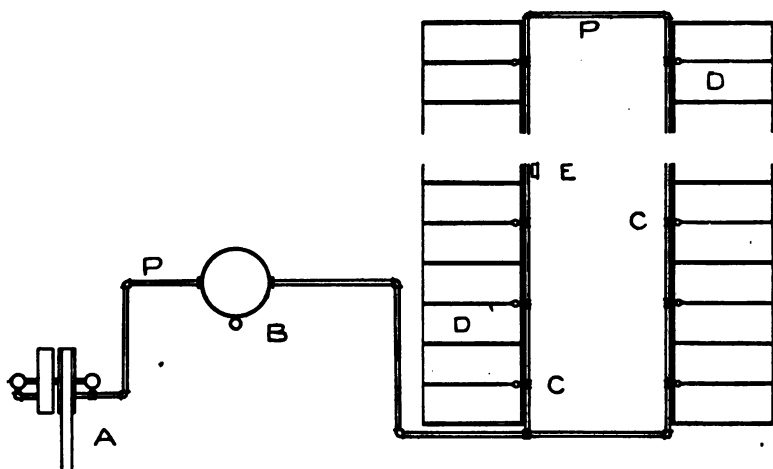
Plan of installation of the milking machine in the University dairy barn. The milking is done by partial exhaustion of the air from tightly covered pails. A partial vacuum is produced by the vacuum pump, A, and the vacuum tank, B, maintains a uniform vacuum of 15 to 16 inches which is indicated by the vacuum gauge, E. The pails are connected by a rubber hose with the stanchion cocks, C. The pails are placed between each two cows in the stalls, D, and a rubber hose, teat cups and mouth-pieces connect the pails with the teats of the cows. The pulsating device subjects the teats to an intermittent suction which draws the milk into the pail.
